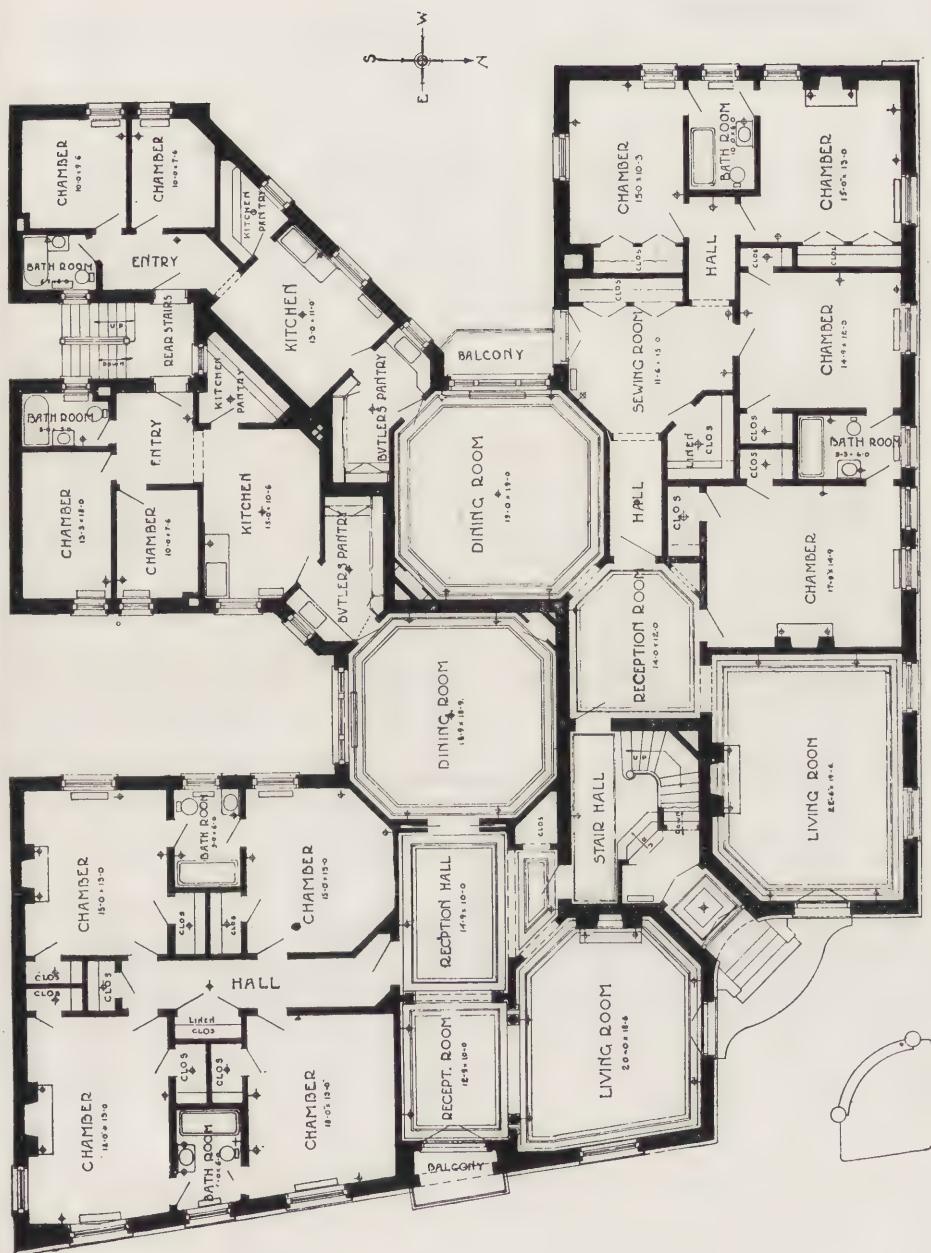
TYPICAL FLOOR PLAN—APARTMENTS AT NO. 1367 NORTH STATE STREET AND NO. 1362 ASTOR STREET, CHICAGO, ILL.
